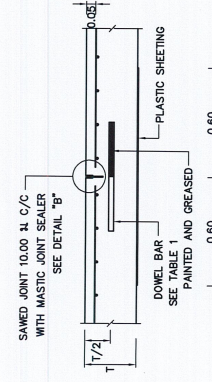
DETAIL OF SAWED FOR LONGITUDINAL JOINT
